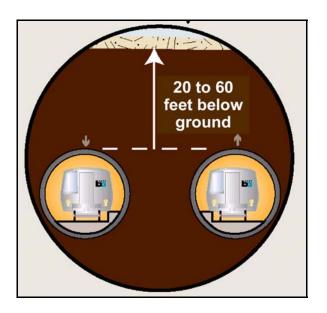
Conceptual Cross Section for BART Alternative Tunnel
